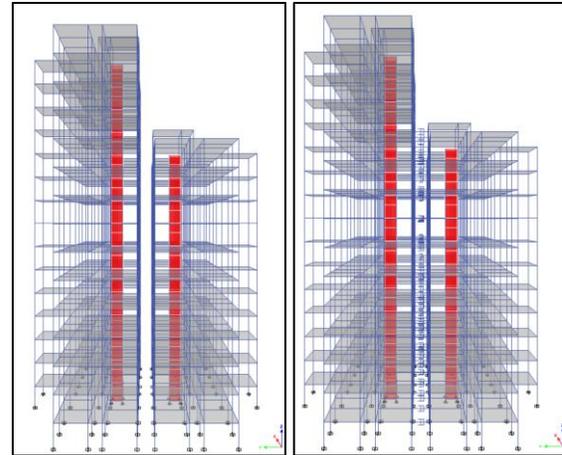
3D view of G+15 and G+10 adjacent Bare Building (Left Side) and Building connected with Fluid Viscous Damper (Right Side)
